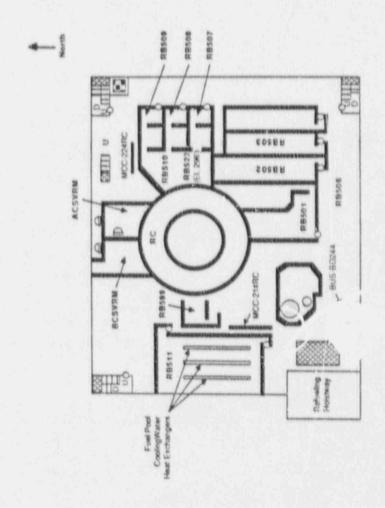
Limerick 2 Reactor Building, Elevation 253'
